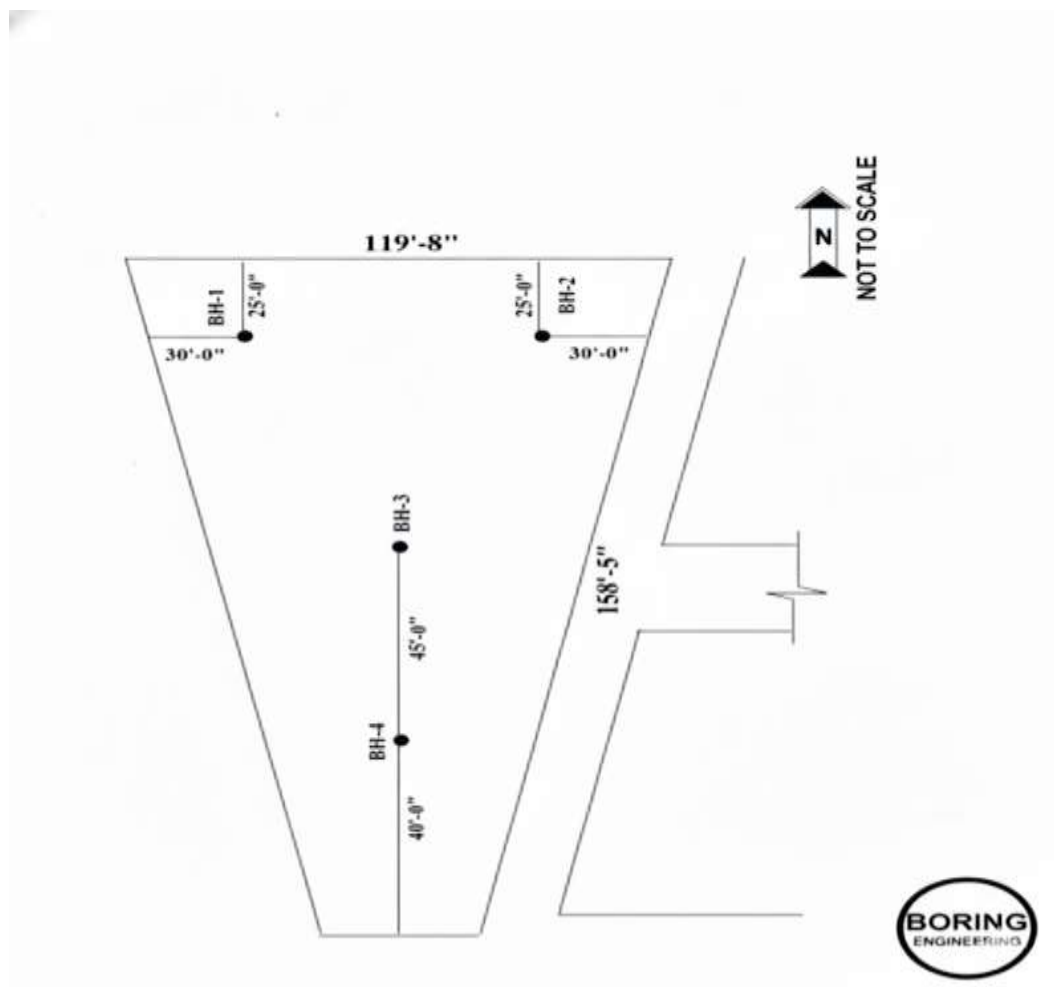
Construction of Proposed 06 (Six) Storied Factory Building Site Plan - Borehole Location Plan (BH-1: 25'-0", BH-2: 25'-0", BH-3: 45'-0", BH-4: 30'-0"; not to scale).
